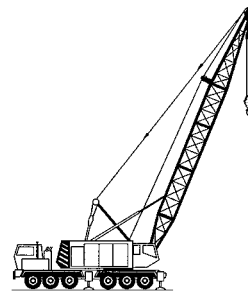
Carrier-mounted lattice boom crane. (Crane Institute of America, Inc.)
